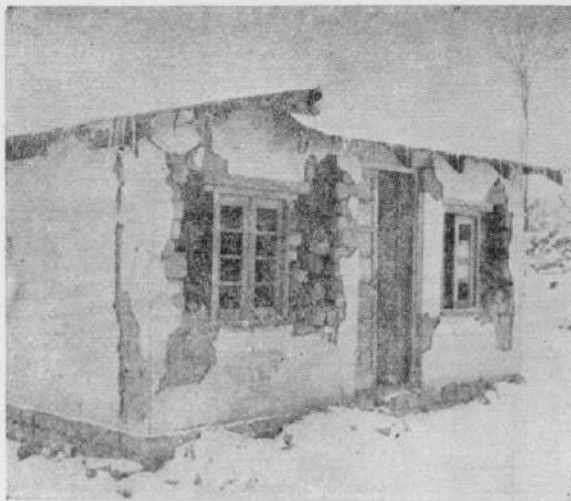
Fall of plaster and development of cracks in the "gramsevak" building at Chango village.
